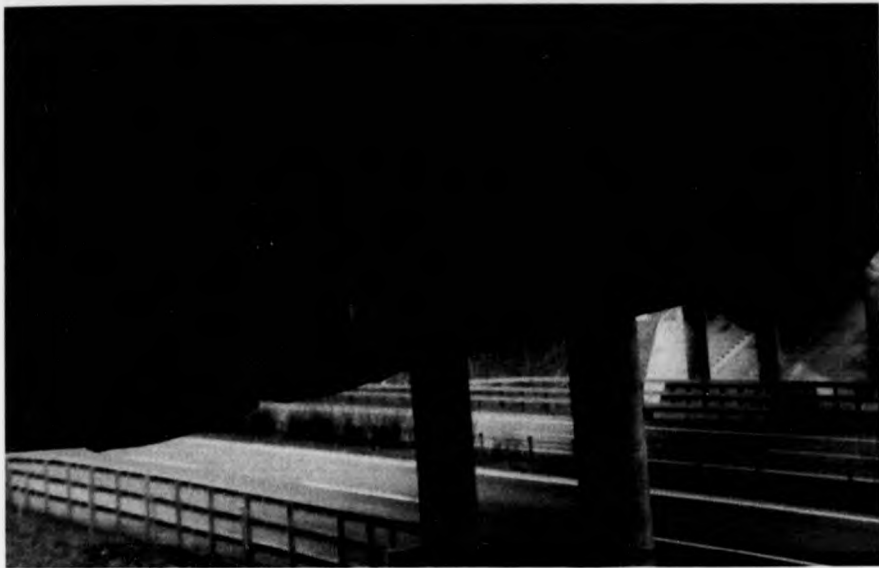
Reinforced concrete bridge which has been shear strengthened in 1997.
